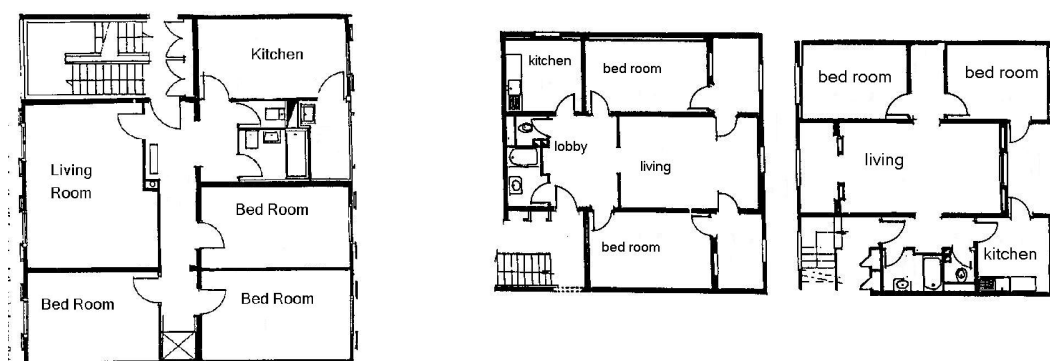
Typical floor plans for Algeria projects [Behloul, 1991]
